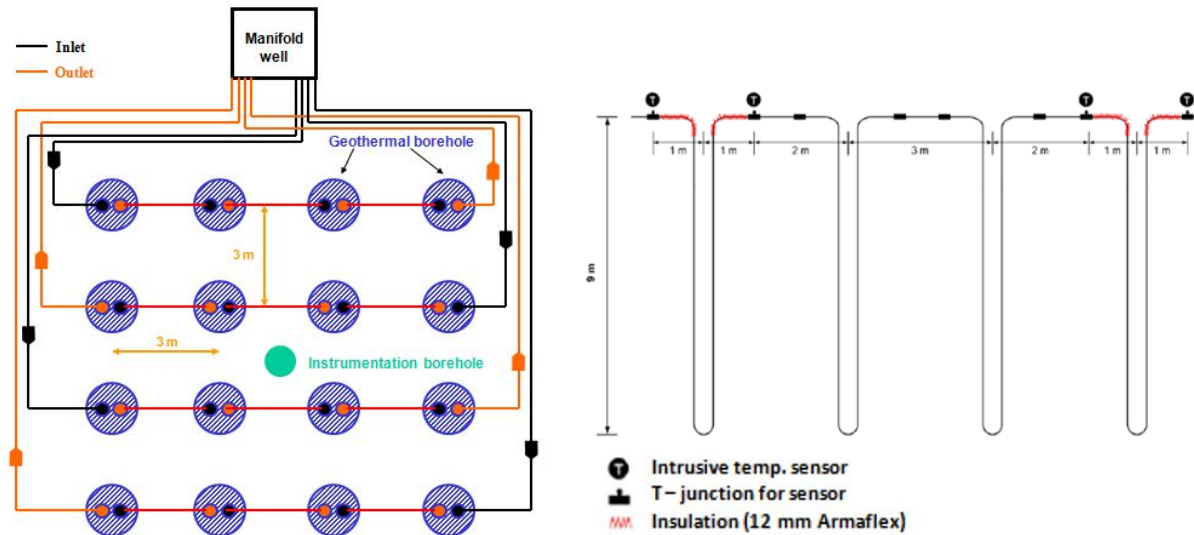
a) Short borehole test facility b) Cross-section showing the first row
